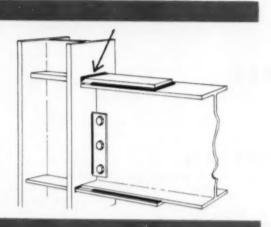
FIG. I—TENSION BUTT WELD (arrow) which was tested by the ultrasonic method.
